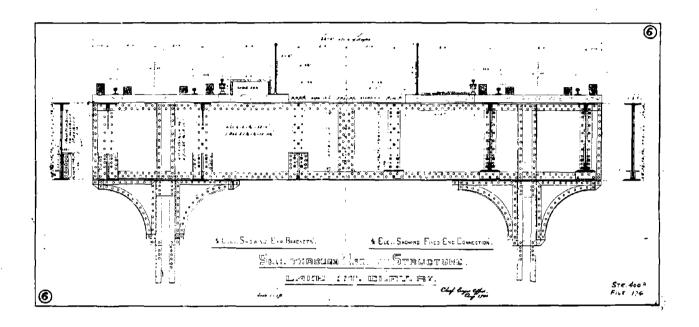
TYPICAL SECTION OF CTA ELEVATED STRUCTURE ON THE IN ON THE LAKE ST. SERVICE
